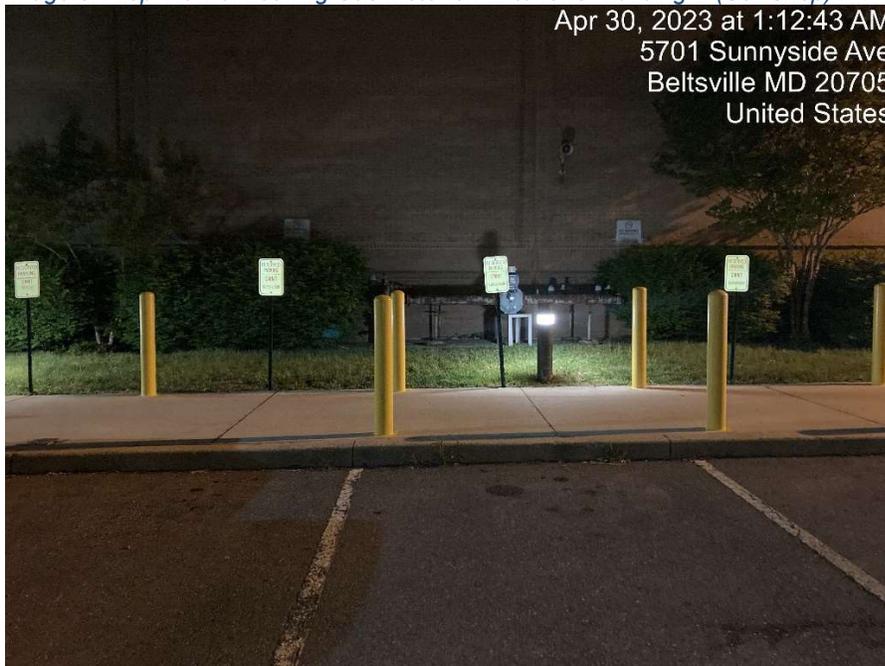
Front View of Leaking Gas Meter on Exterior of Building B (S&I Shop)
